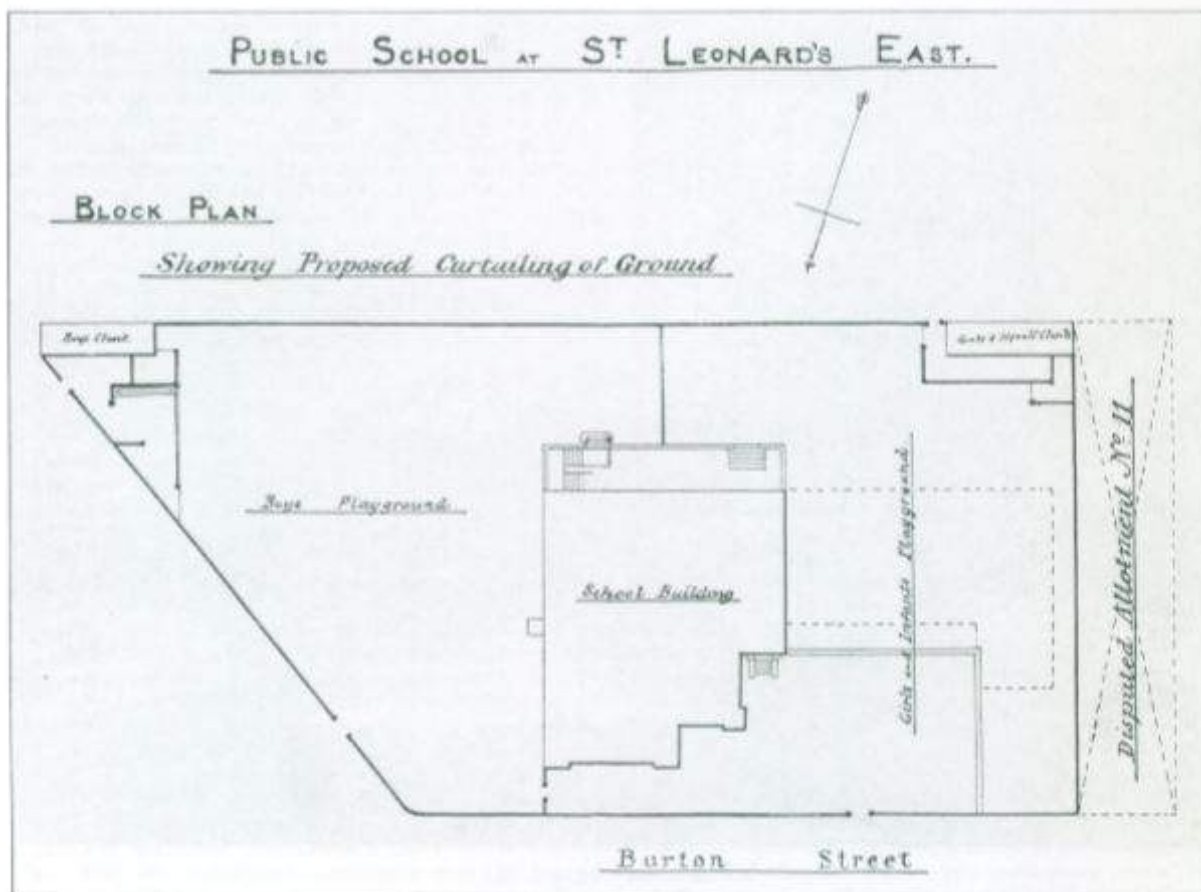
Proposed plan of St Leonard's East Public School, no date but likely 1886. Regan 1987:13.
